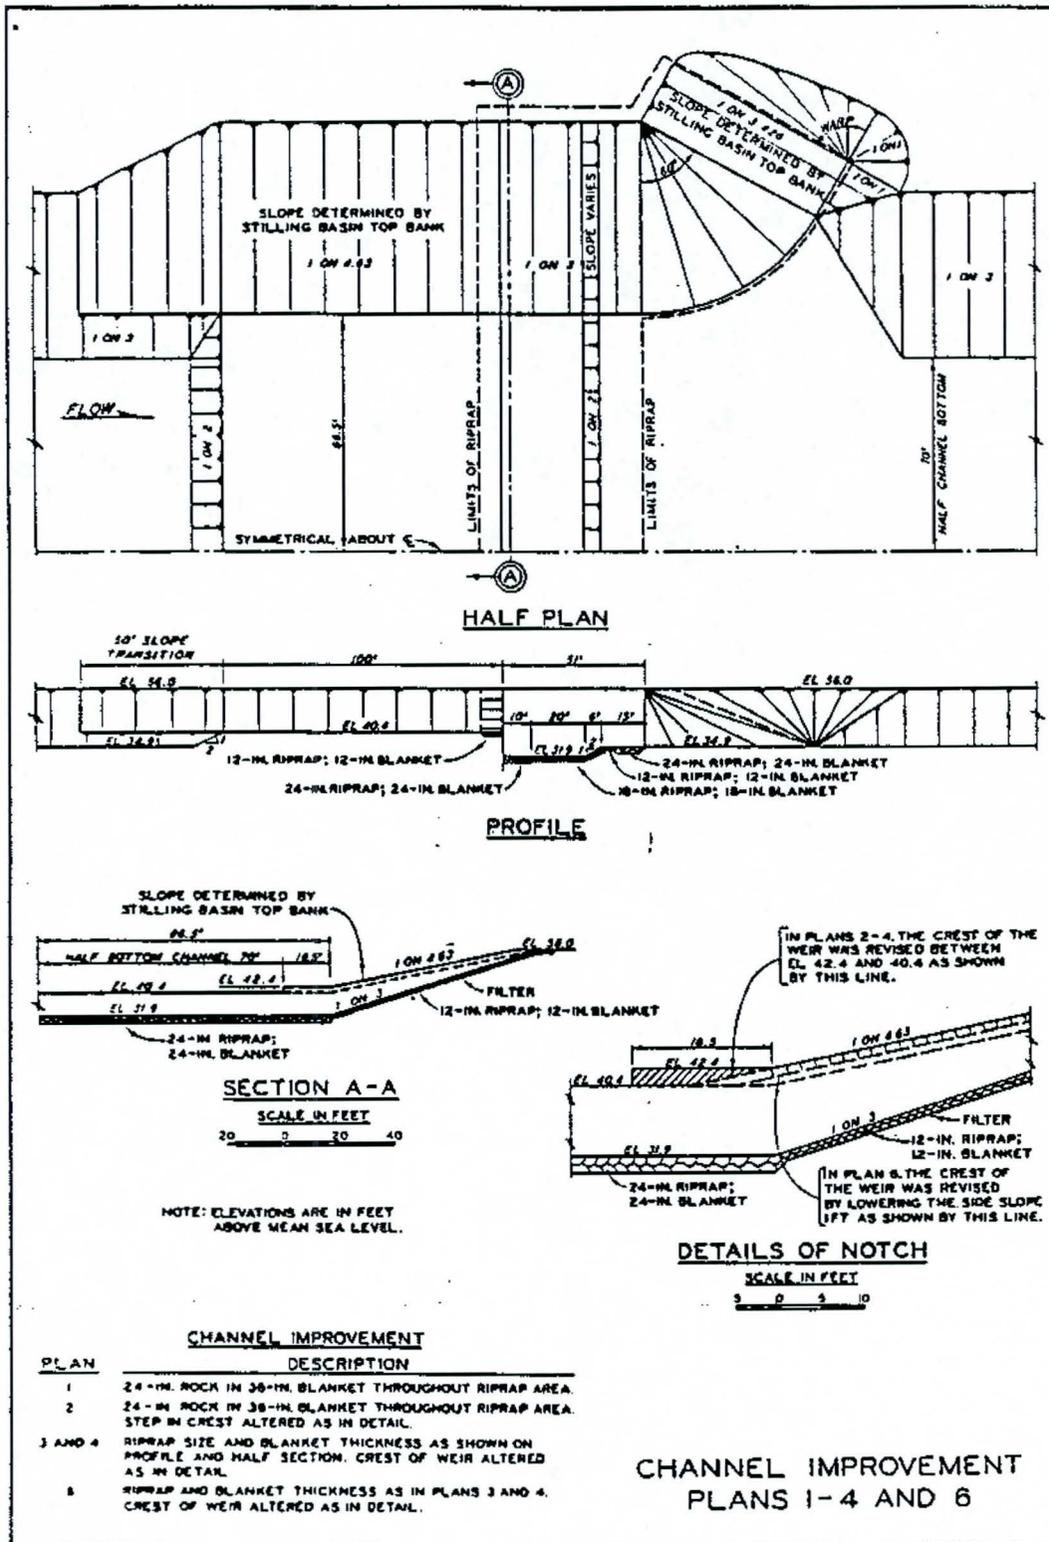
Channel-improvement plans using low-water weirs (after Ables and Boyd 1969).
